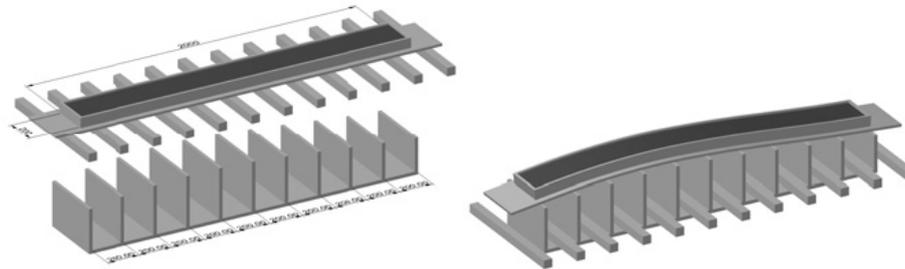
First simple test setup: a single-curved formwork, in which first the concrete is cast in situation (a), and after some tens of minutes the flexible formwork and the still unhardened concrete are deformed into the desired shape (b)
